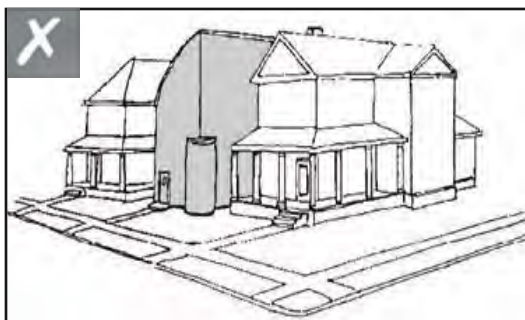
Example of inappropriate massing and form of new infill building, which contradicts the existing form and vocabulary of adjacent historical buildings
